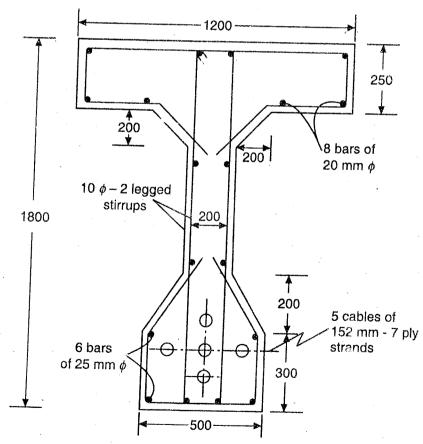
Reinforcement Details at Centre of Span Section.
